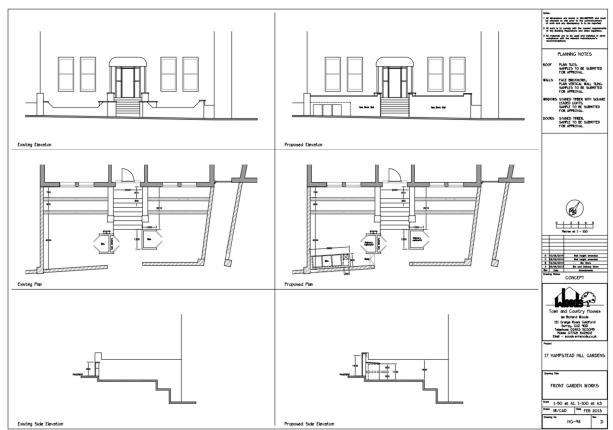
Approved drawings from application 2014/9667/P. The existing boundary wall and stores are built out in accordance with this proposal.
